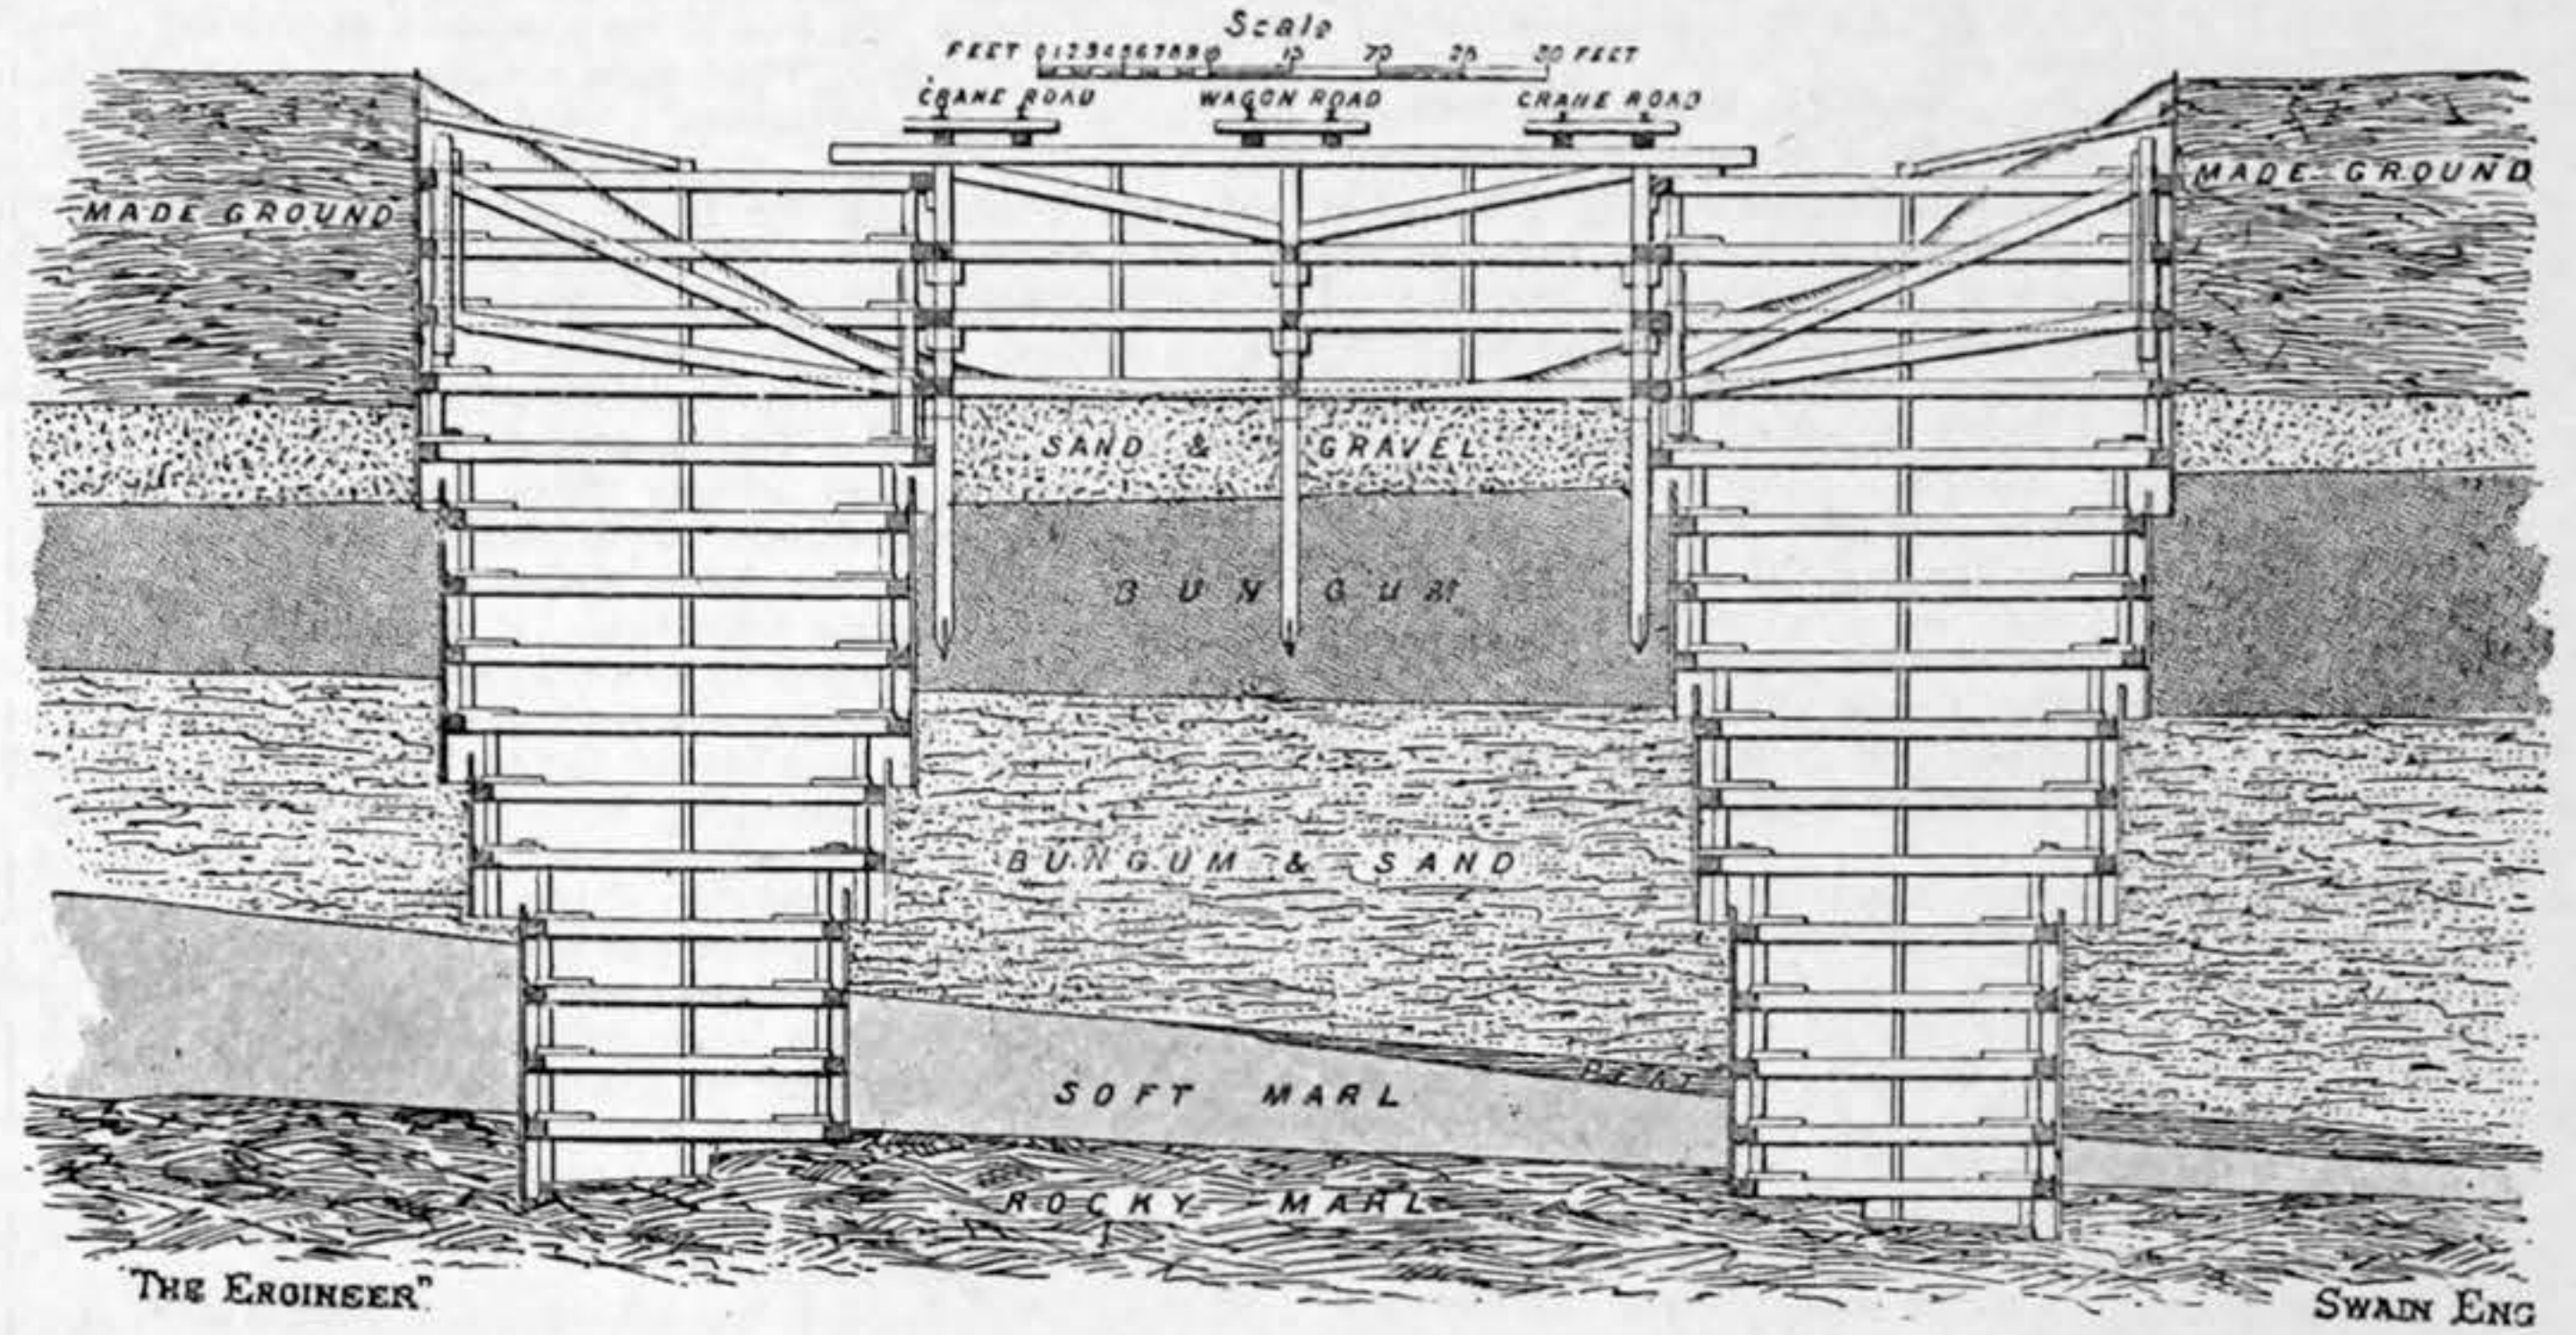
TIMBERING FOR NEW DOCK EXCAVATION
